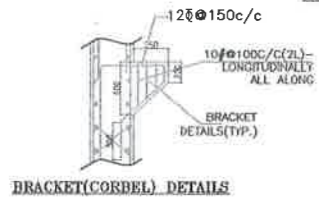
DETAILS FOR RCC DRAIN STRUCTURE (FOR CLASS II LOADING)
